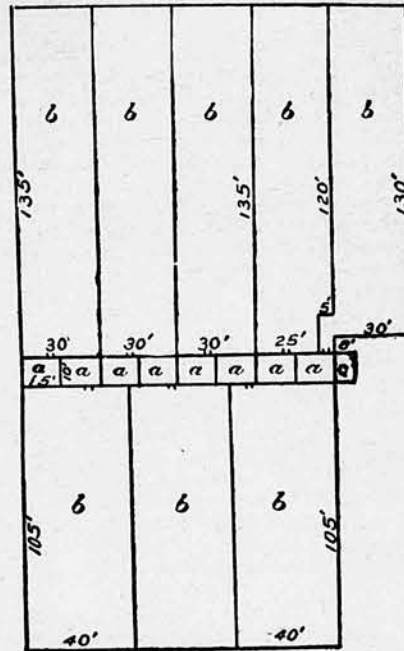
Plan of poultry building and yards. a, pens 10 by 15 feet. b, runs, one for each pen. c, feed room, 8 by 10 feet.
